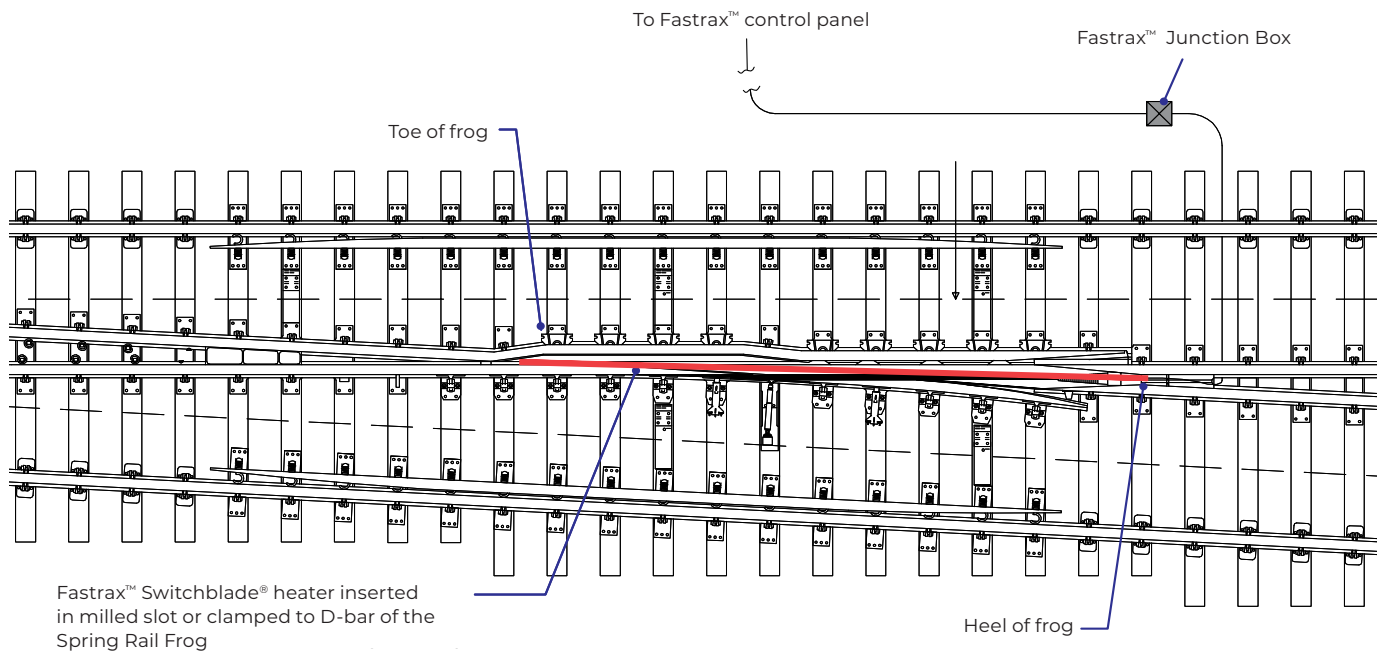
Typical Spring Rail Frog Heating Layout - Equipment Detail, All Standard Sizes (All Tie Styles)
